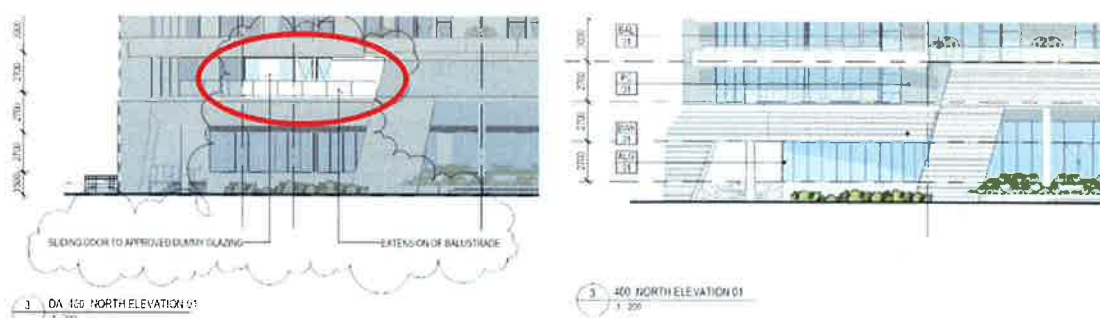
Circled in red, proposed elevation changes (left) and approved elevation changes (right)
